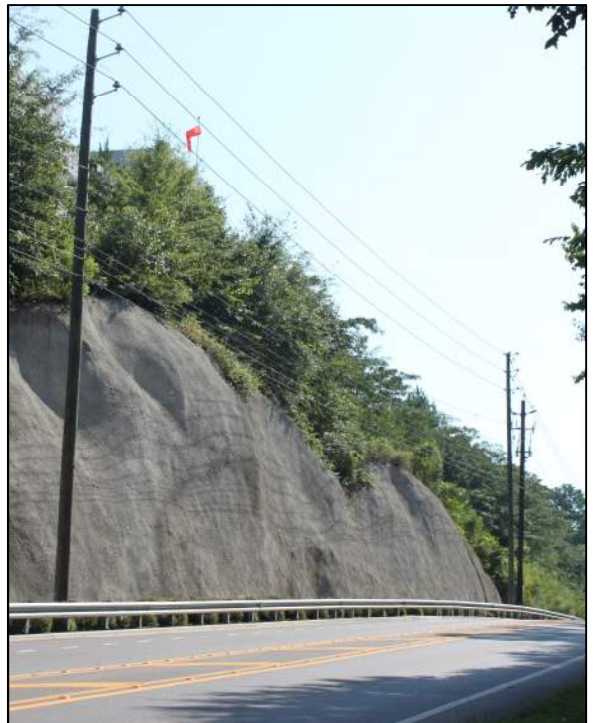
2-Lane Section West of Acton Road; note steep embankments
